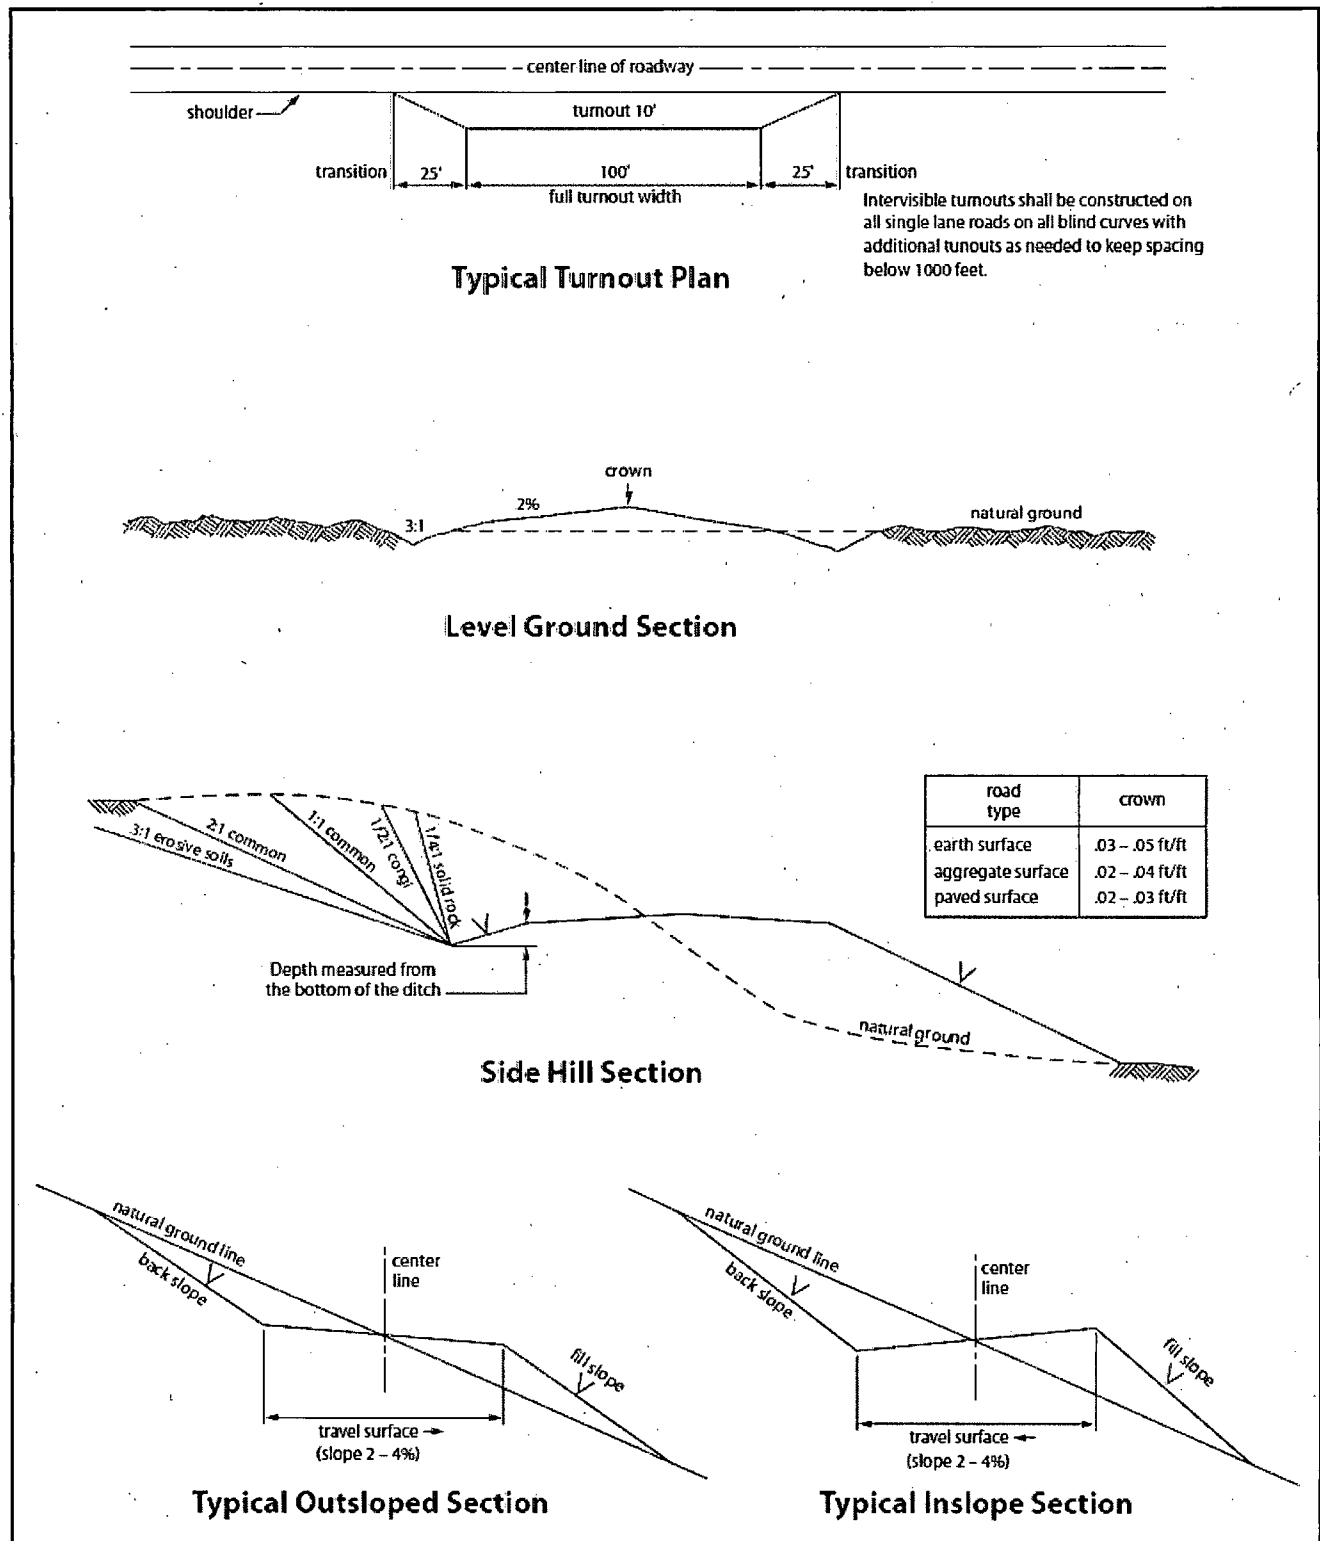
Cross-sections and plans for typical road sections representative of BLM resource or FS local and higher-class roads.
